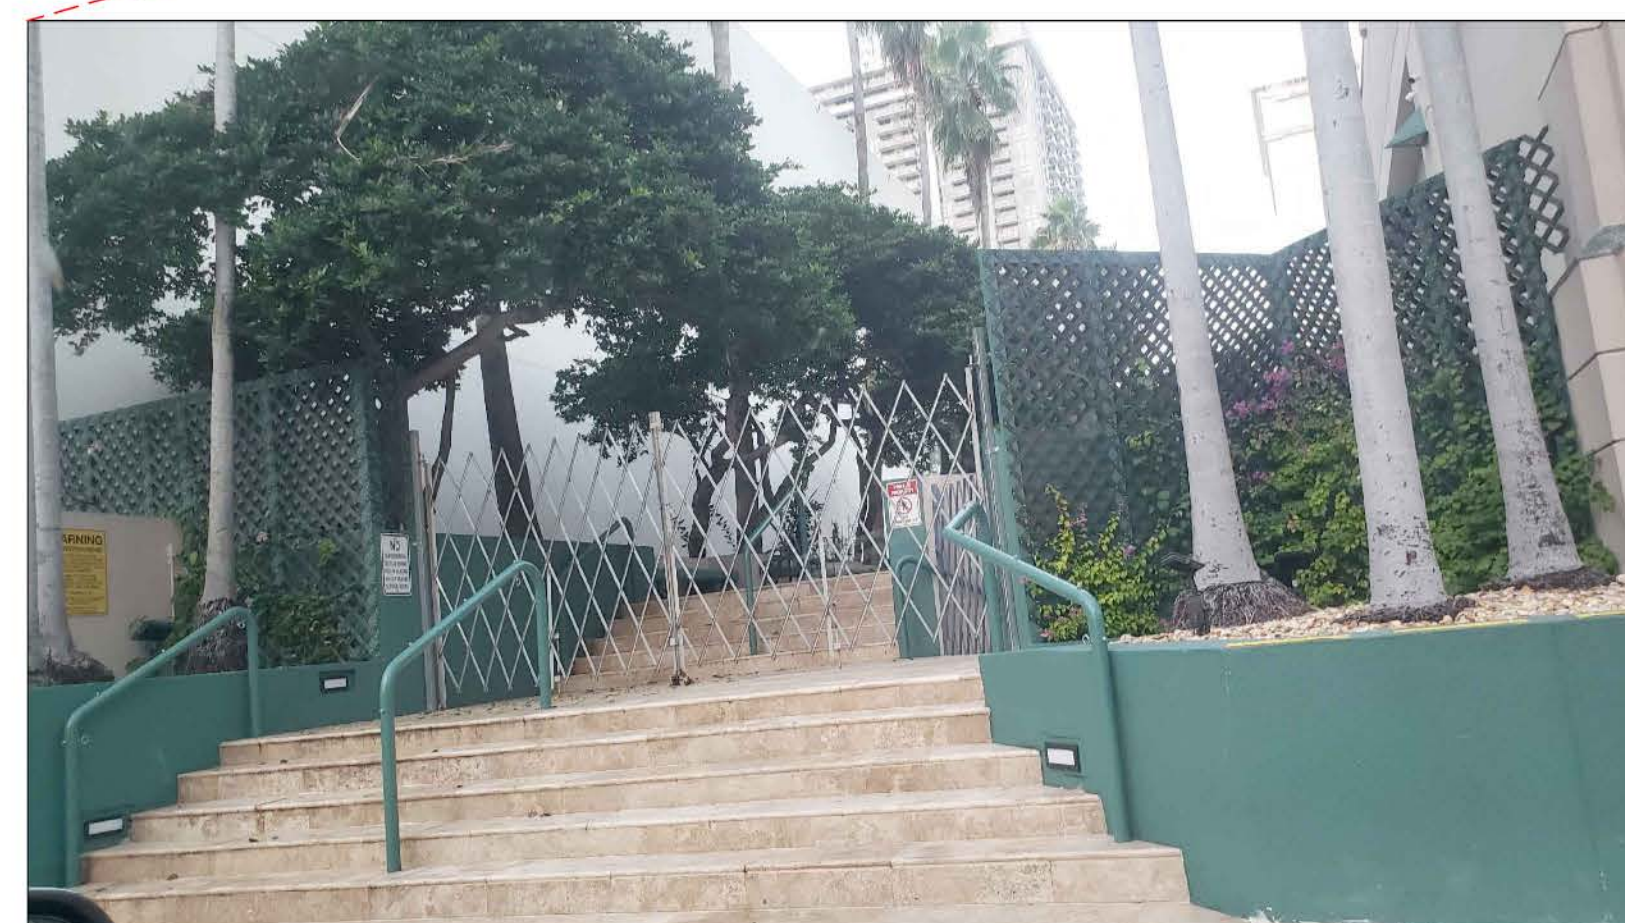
(ACCESS STEPS FROM STREET LEVEL)
